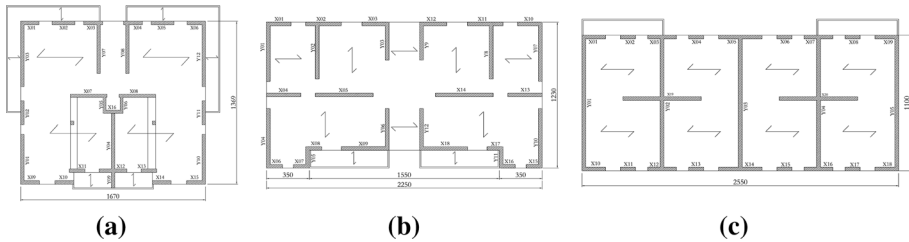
Examples of plan configurations of the analysed buildings: a Building 1; b Building 8A; c Building 9 (Morandi 2006). All dimensions in cm
